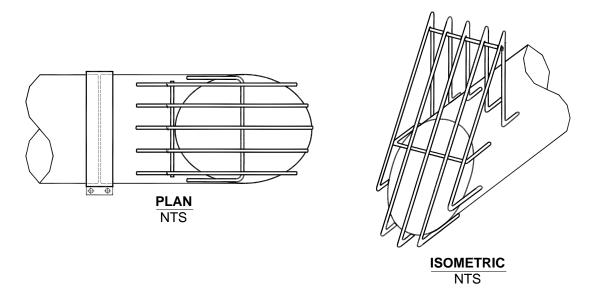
D DEBRIS BARRIER (OFF-ROAD RIGHT-OF-WAY)
